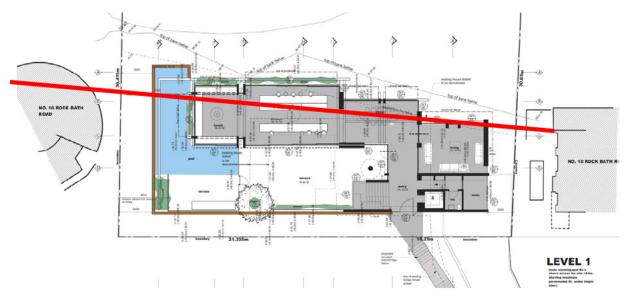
Level 1 floor plan with red line showing required façade alignment to maintain a view sharing outcome.
